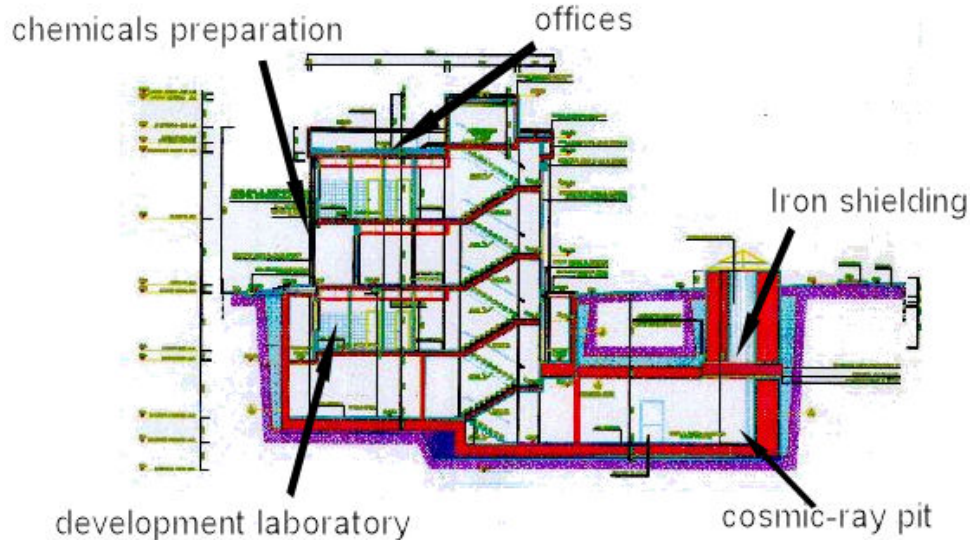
Vertical layout of the development facility building (Lab1) at LNGS.
